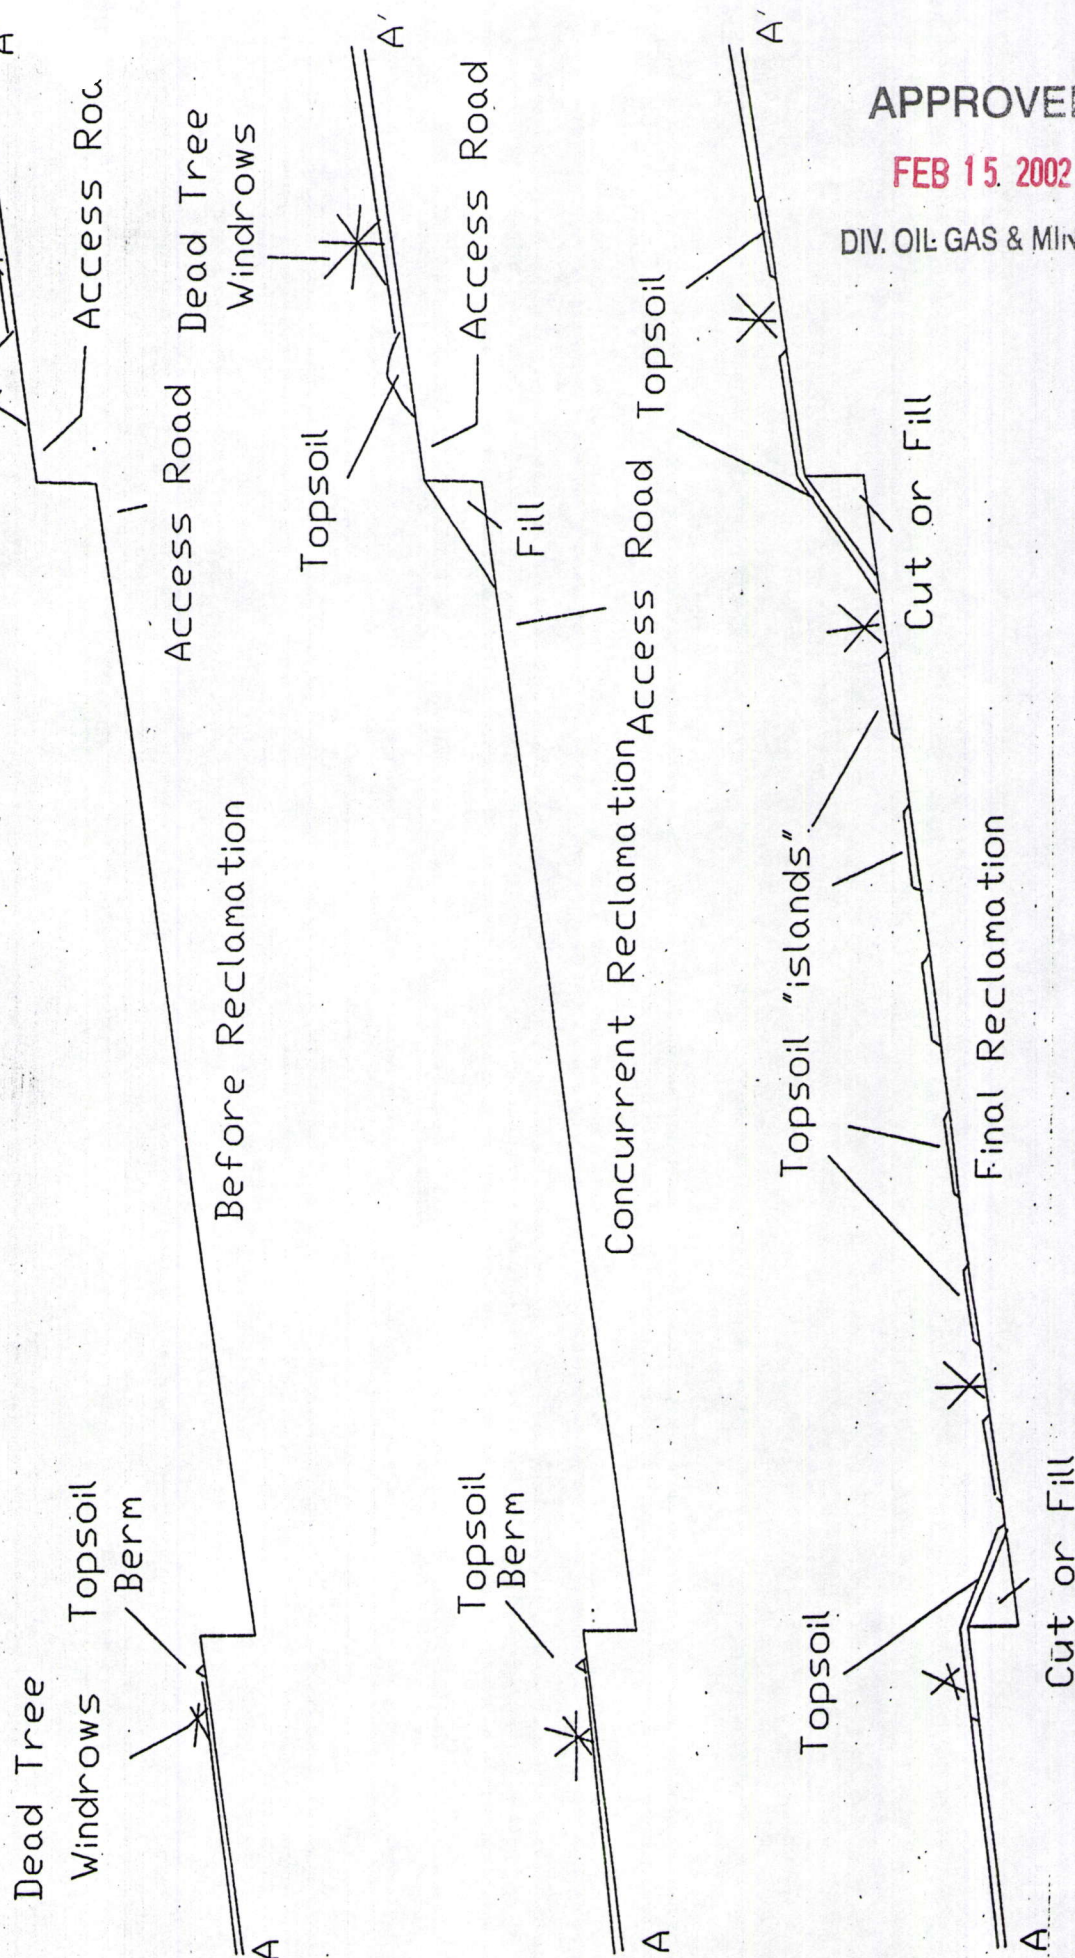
Papoose Limestone Mine Reclamation Plan Cross-Section
